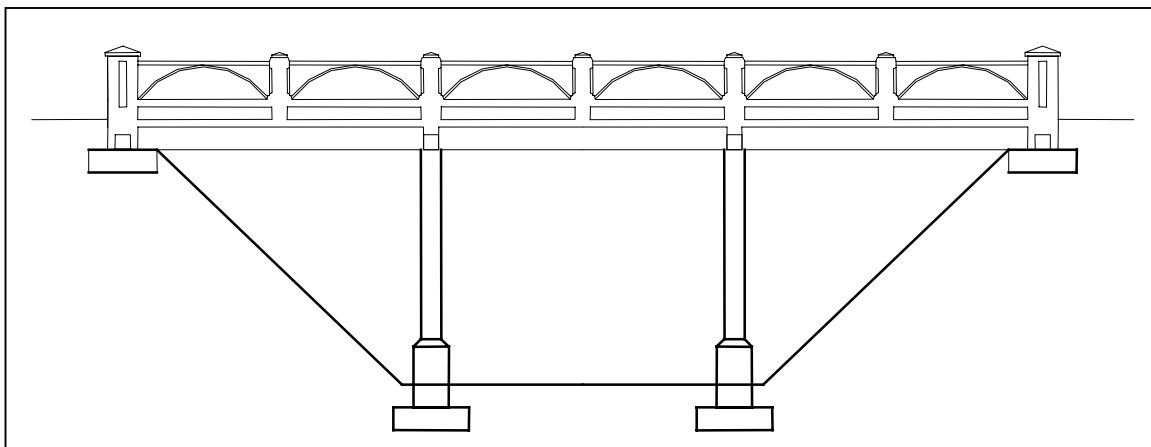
Elevation of Horsetail Creek Bridge (No. 04543)
